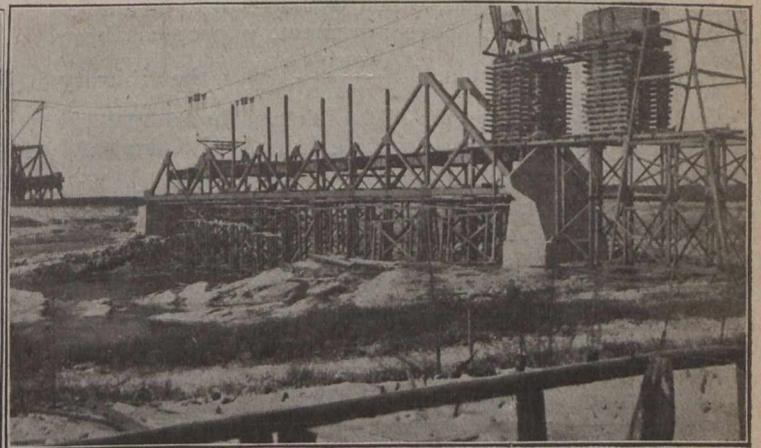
Lower Steelwork for Northern Anchor-span Erected; Traveller Raised on Blocking, for Working on Top-chords
